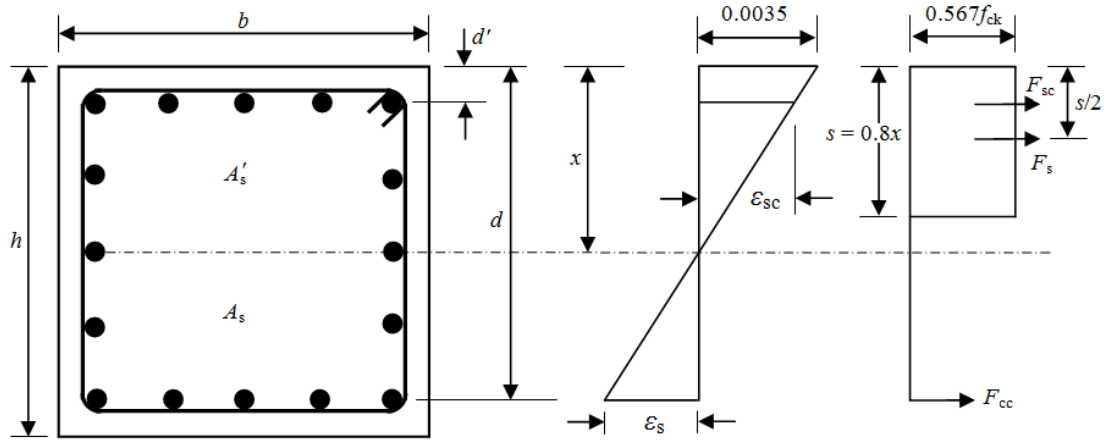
Illustration of column/pier cross section, stress and strain distribution.
